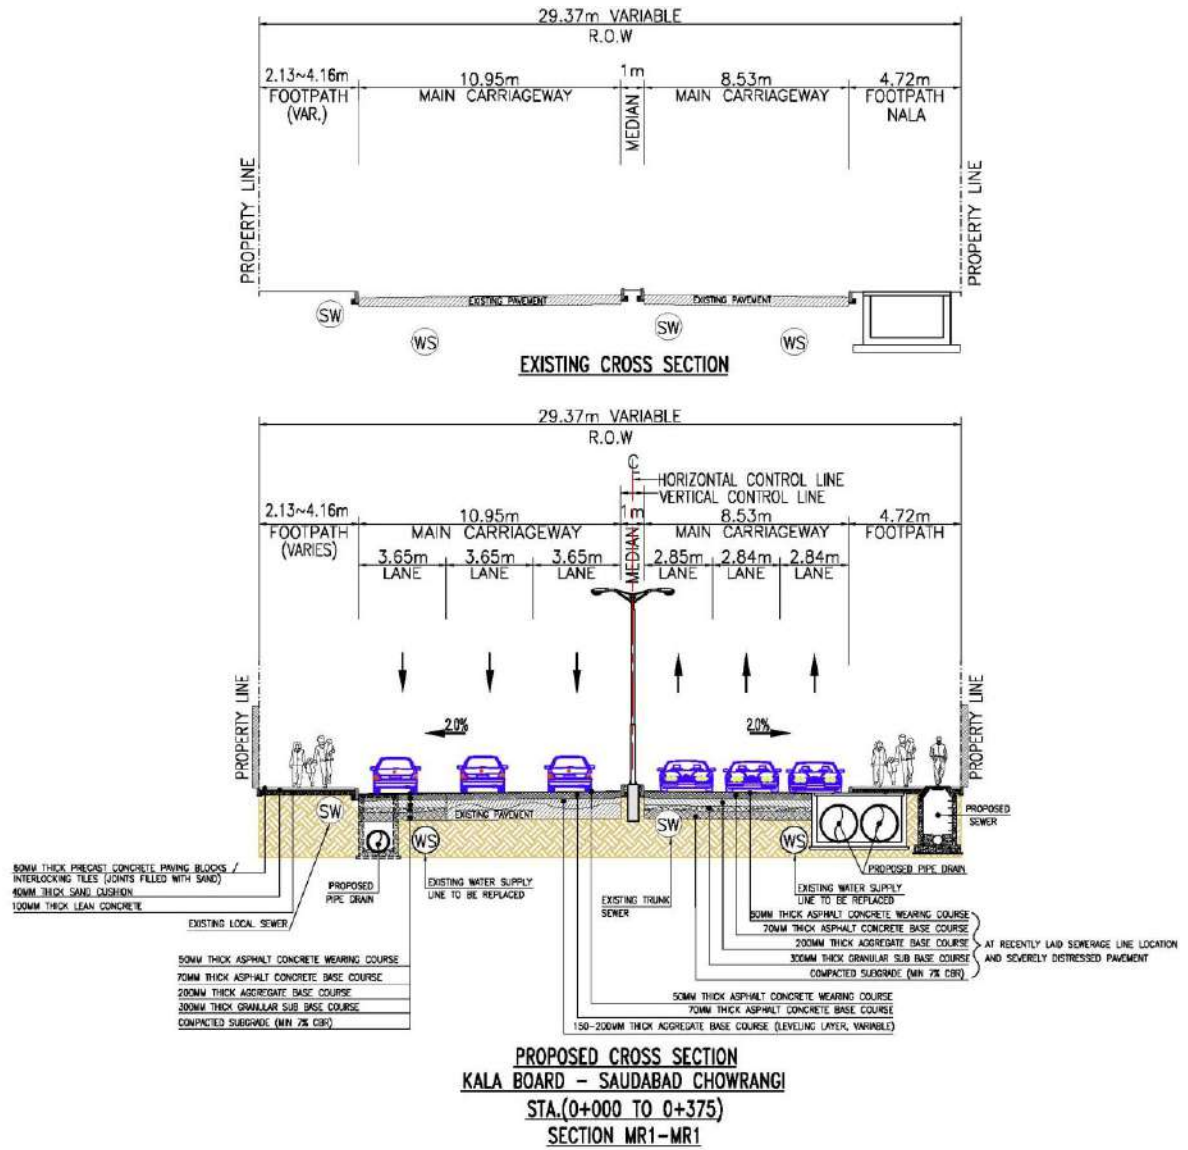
Existing and Proposed Cross Section of Kala Board to Saudabad Chowrangi (0+000 to 0+375 km)
